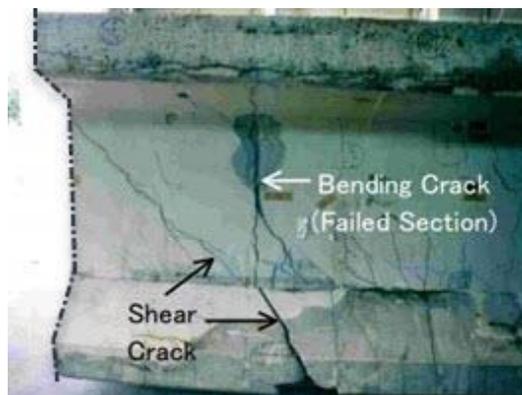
Kure-tsubo Bridge (ID-39). Cracks around failed section of beam S3 (Tanaka et al, 2001).
